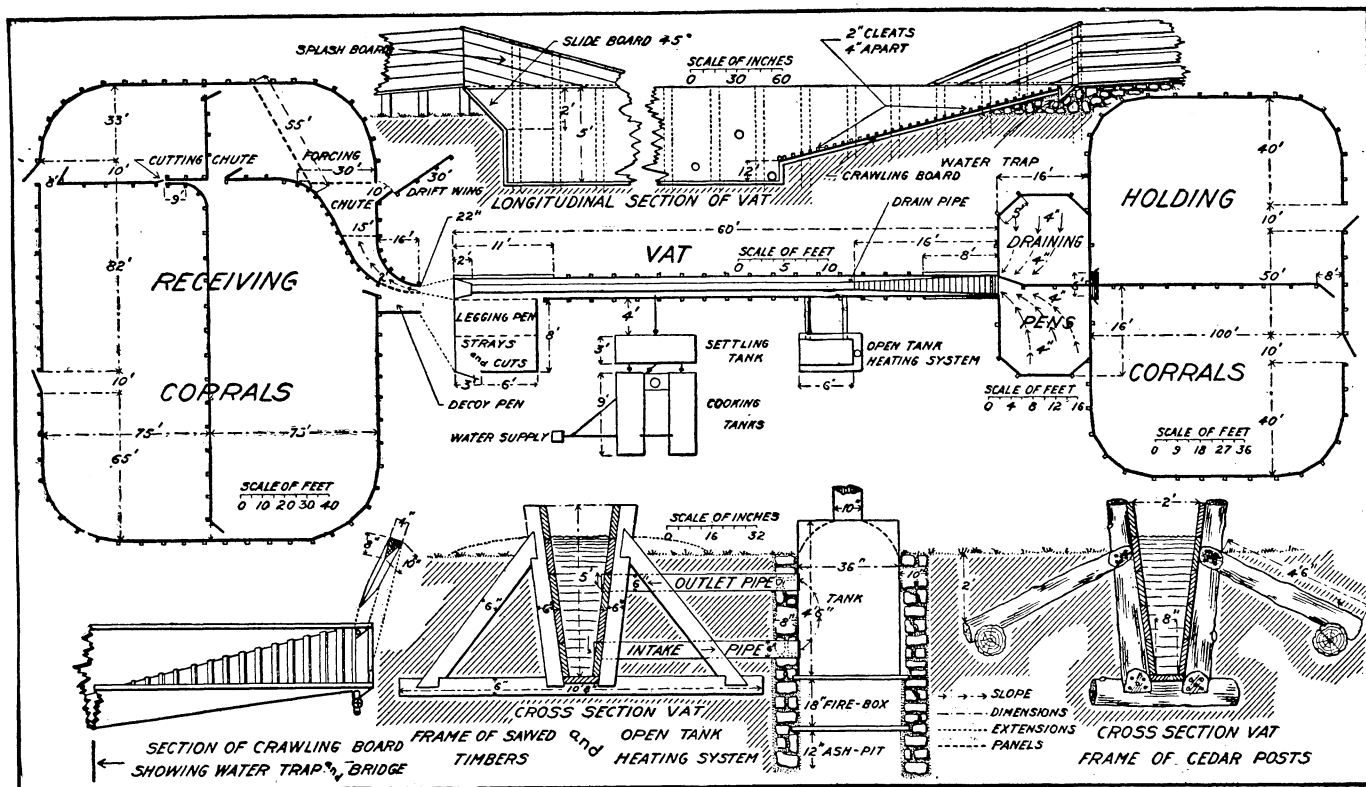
Plan of sheep-dipping plant; wooden vat
